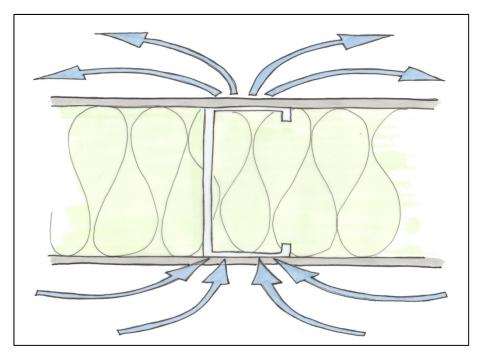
Heat transfer through a building element. Heat energy will conduct through the weakest element in a constructions thermal envelope – in this case the steel stud in an otherwise insulated wall.
